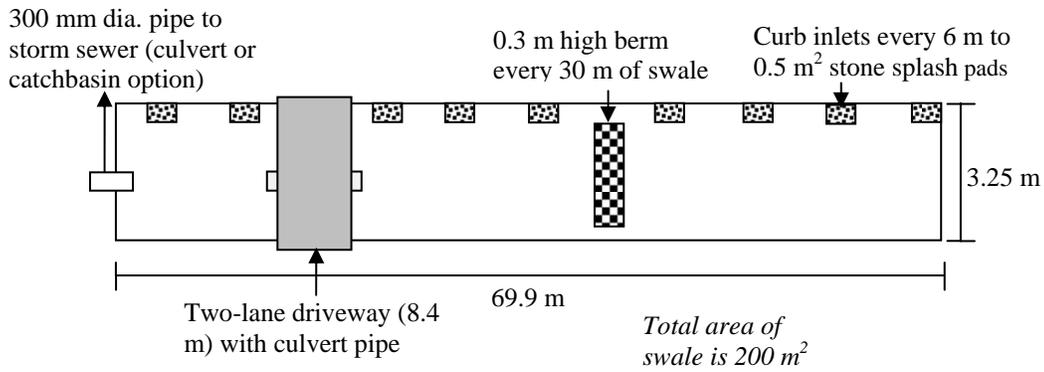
Plan view of enhanced grass swale. Drainage area is 2000 m²
